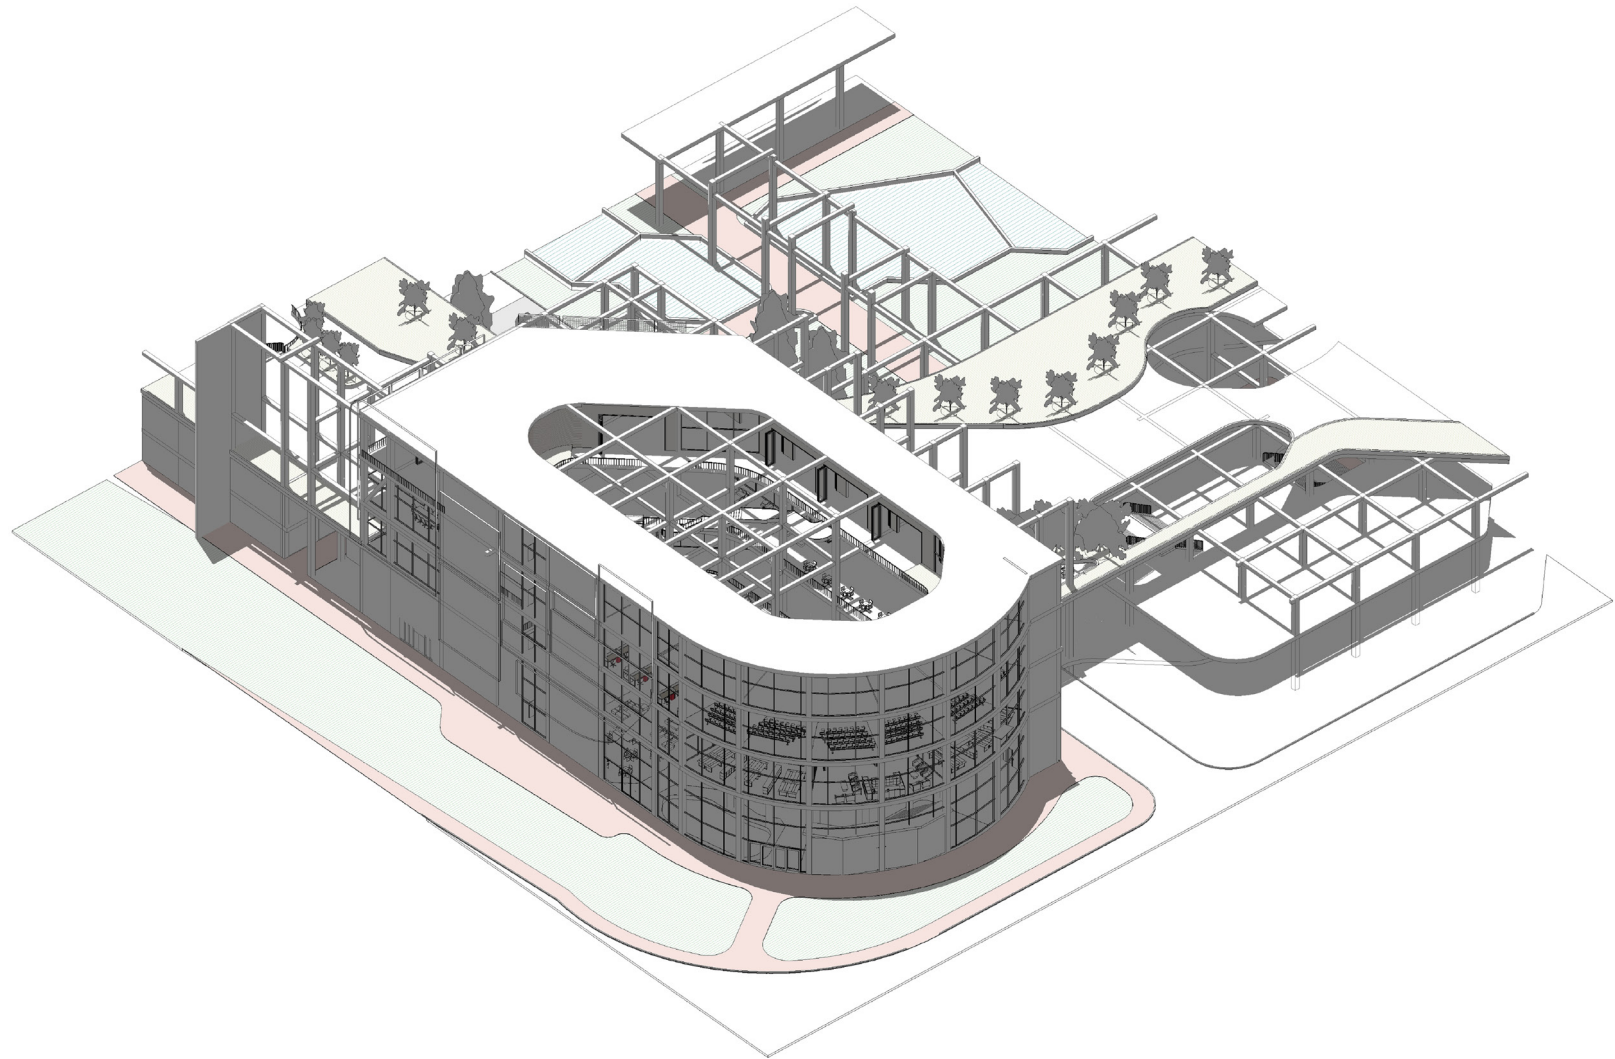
AXONOMETRIC THIRD FLOOR (AUTHOR 2021)
